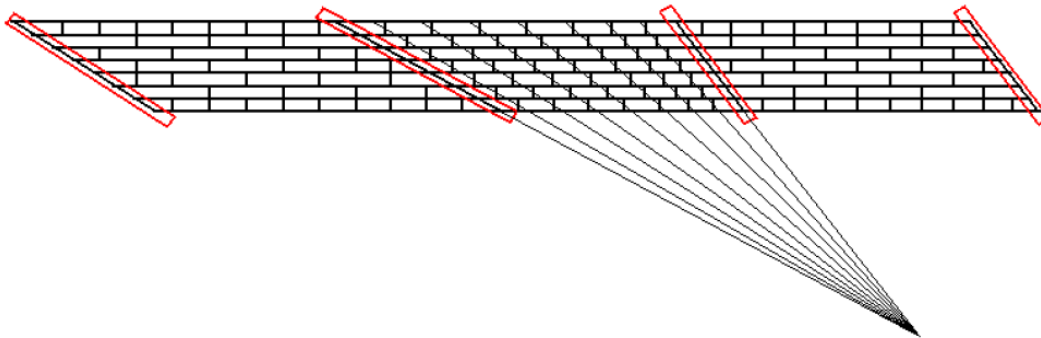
Sketch of an alternative staggered “fanned” cross-frame layout for a nonparallel skewed bridge (White et al., 2015).
